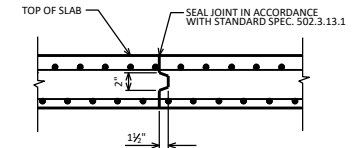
DETAIL TRANSVERSE CONSTRUCTION JOINTS 5'-0" FROM C/L OF IN SPAN HINGES, (ONE ON EACH SIDE OF HINGE) THE CONCRETE BETWEEN THESE JOINTS SHOULD BE THE LAST POUR PLACED.
